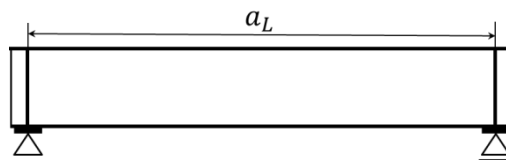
Girder with No Intermediate Transverse Stiffeners
